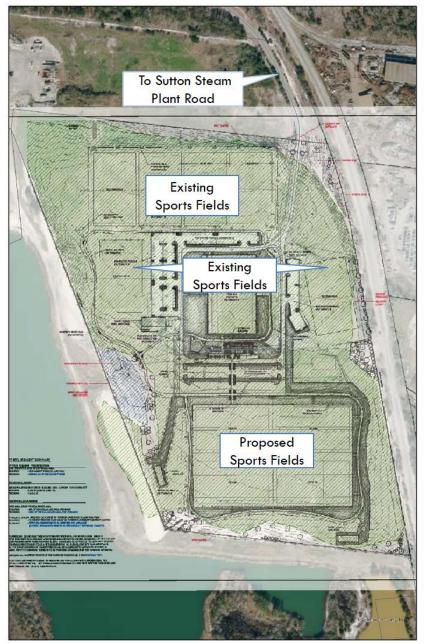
Aerial with Applicant's Conceptual Plan with Staff Markups
